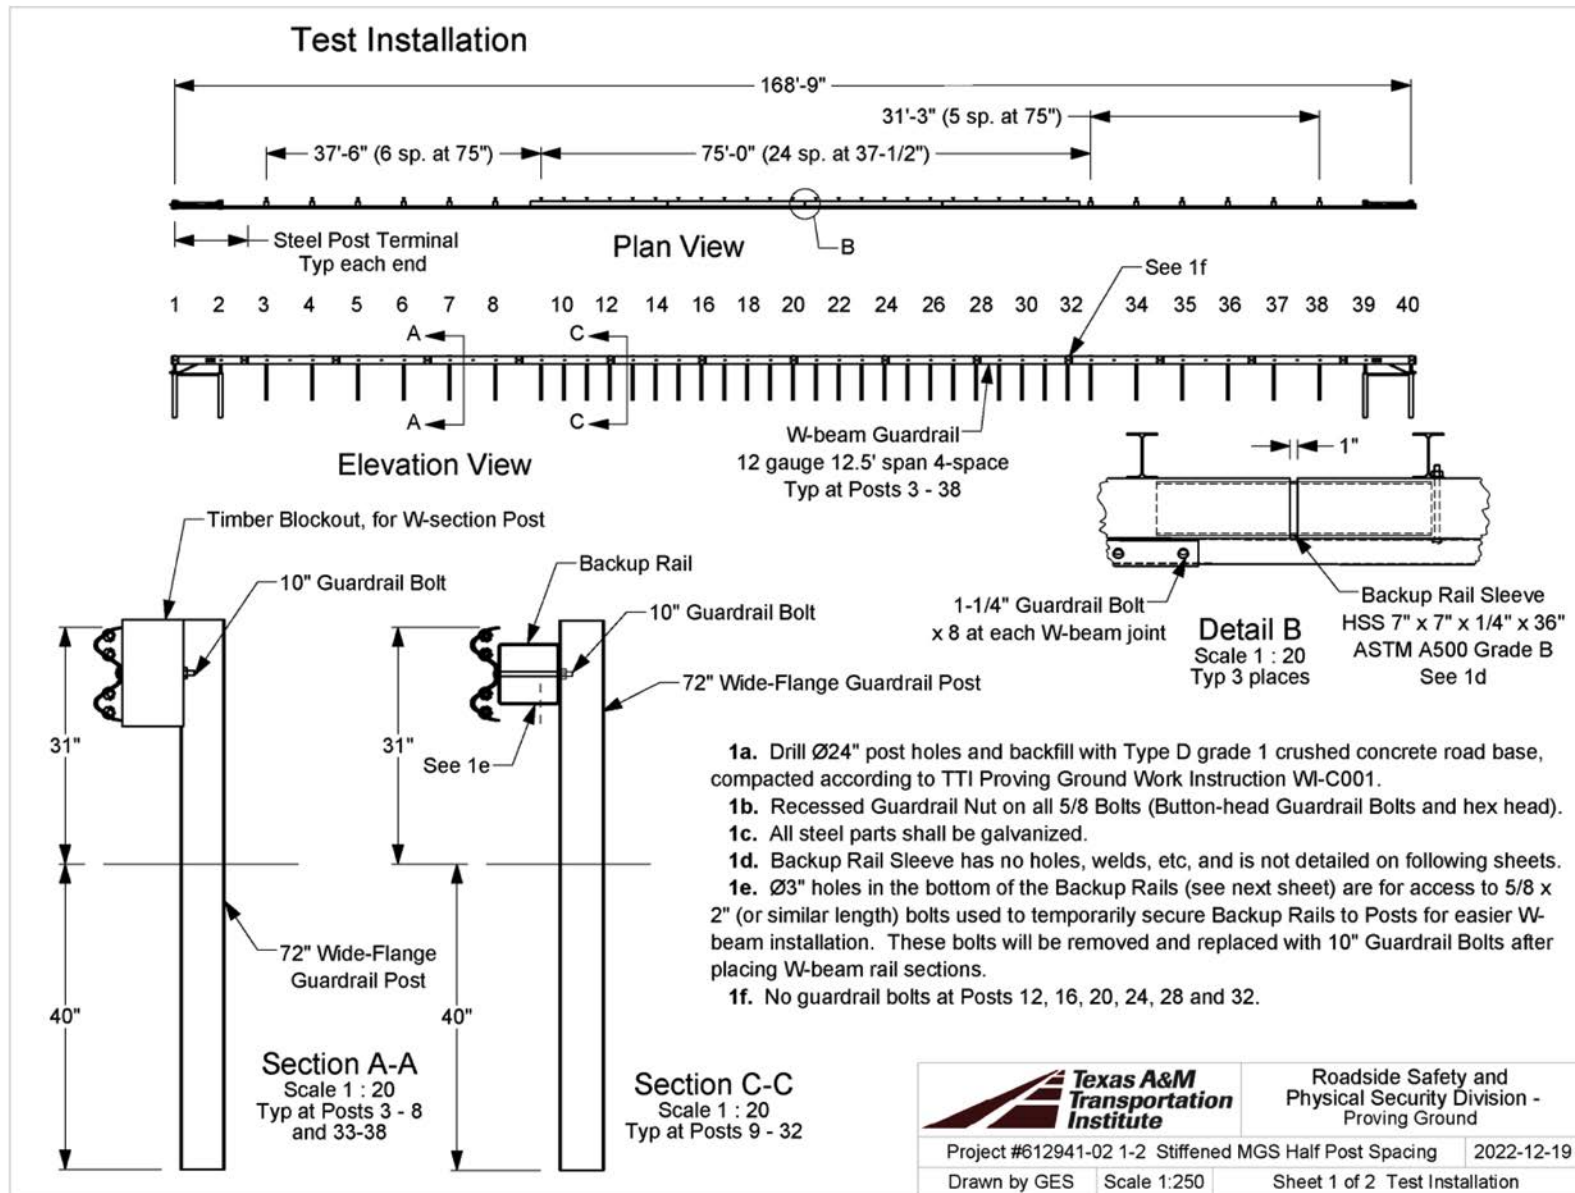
Tests 612941-02-1 and -2 installation details.
